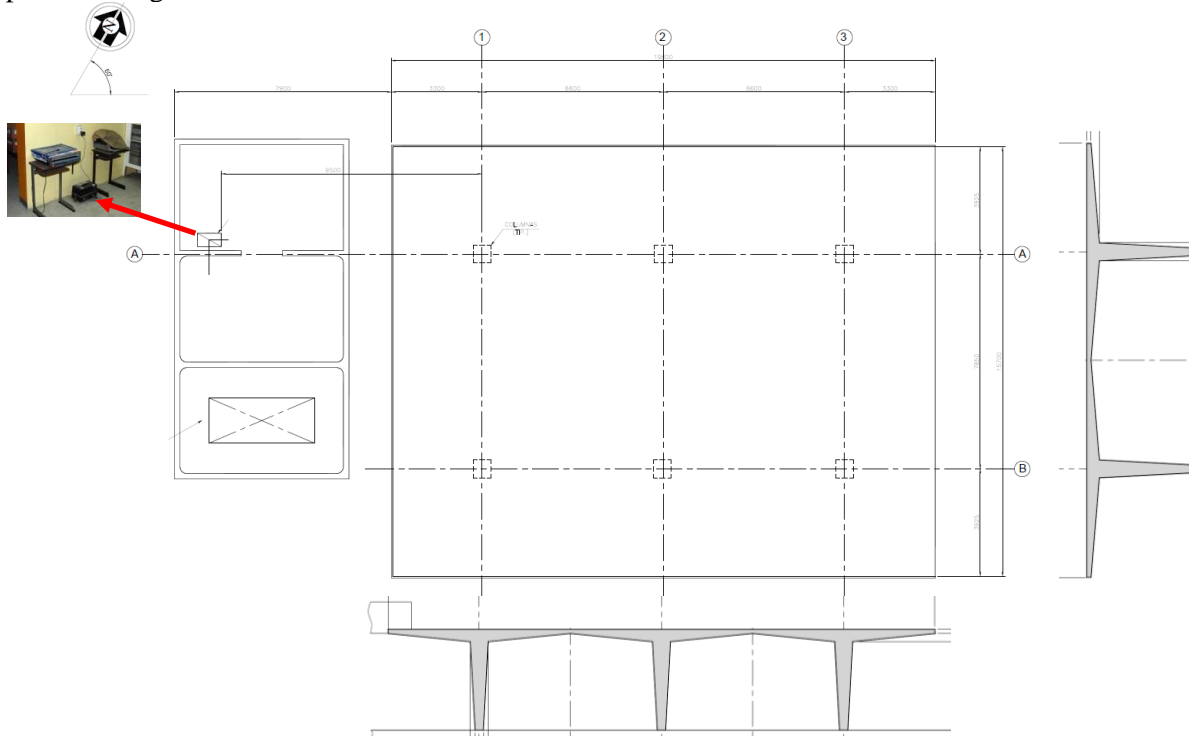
Canopy structure. Plan view, Elevations and plant showing accelerometer distance 10 m.
